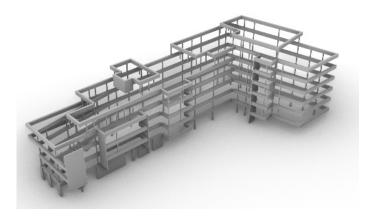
3D model of exterior load-bearing structure consisted of double-layered walls and beam-column system
